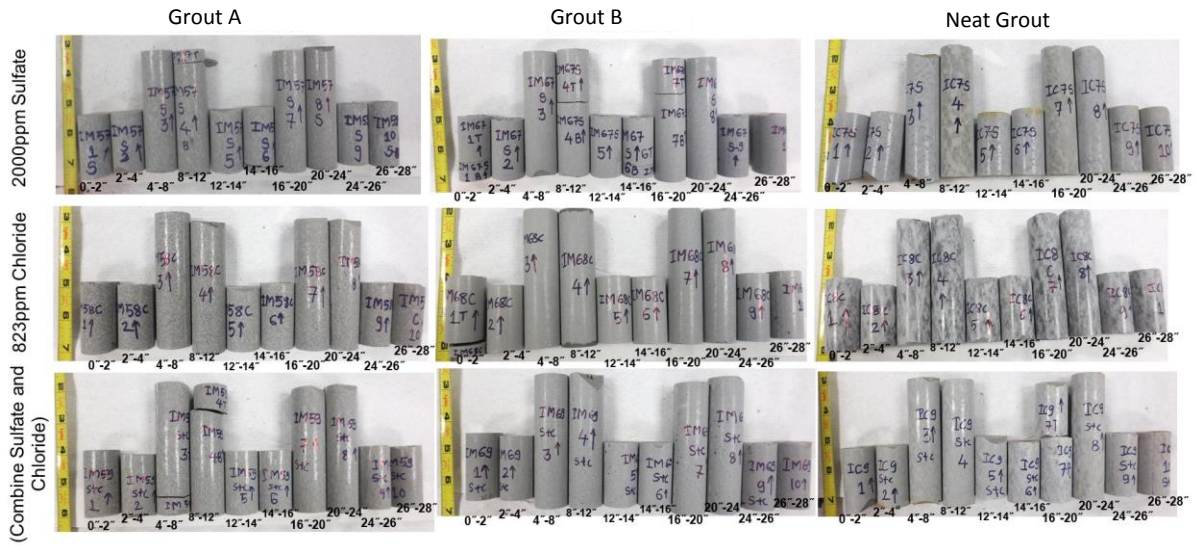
INT Tee-header test specimen after opening, cast with external ion contamination and extra 10% mix water
